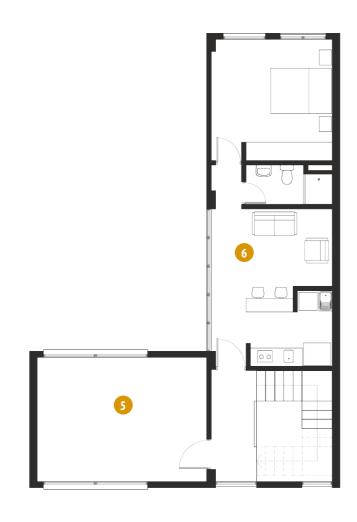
TYPOLOGY E\_GROUND FLOOR PLAN
